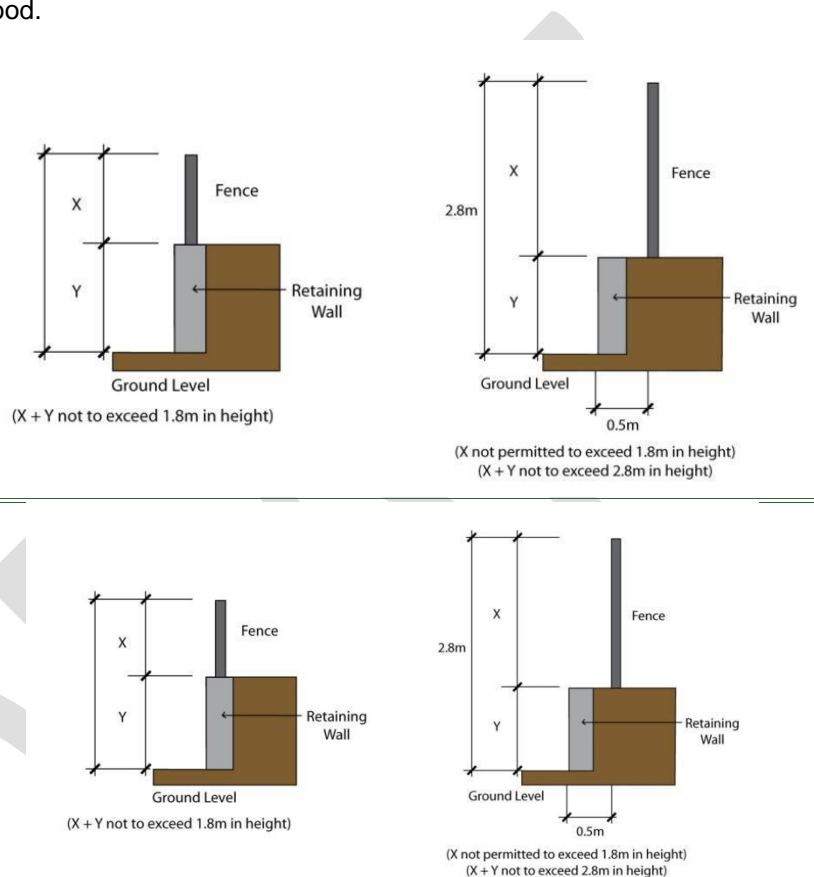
Lot Fencing Abutting a Road Reserve on a Retaining Wall
